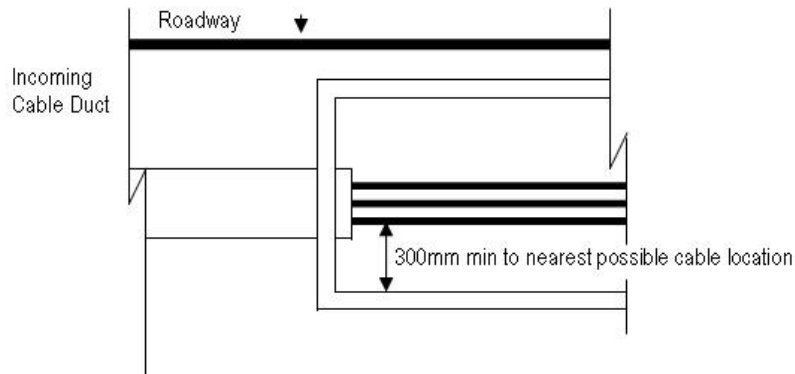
shows cable entry details where cable bends need to be accommodated within the underground enclosure (not applicable to joint bays or 11kV narrow pits).
